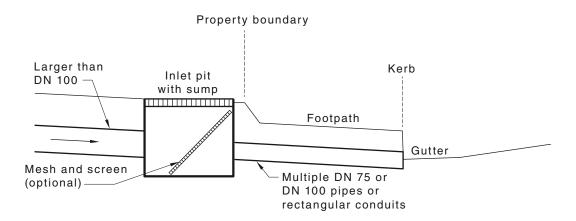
TYPICAL ARRANGEMENT OF INLET PIT AND FOOTPATH CROSSING
